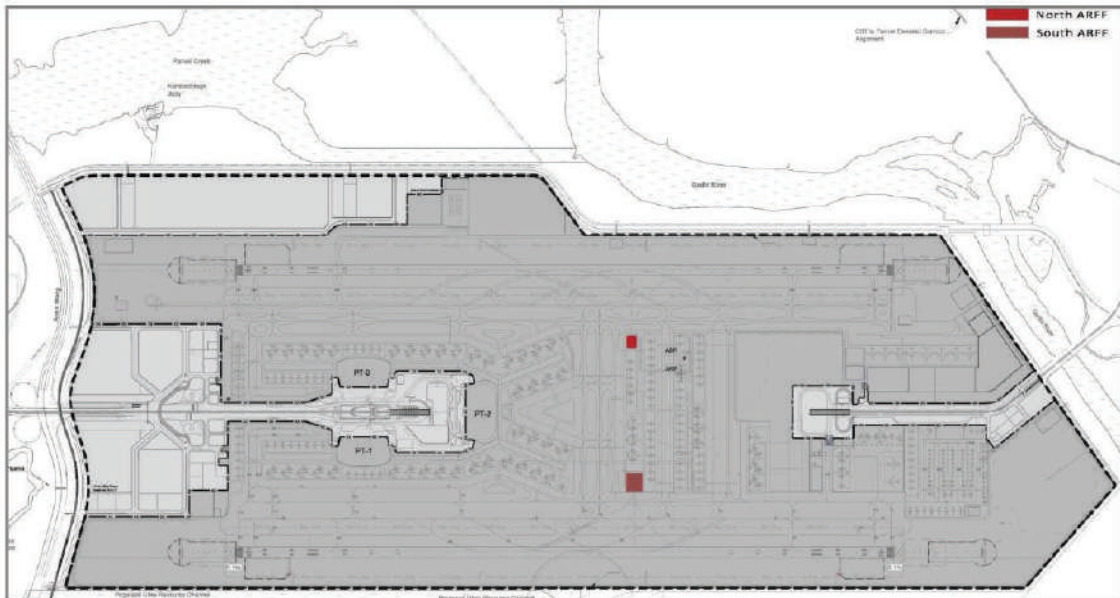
Air Rescue and Firefighting Facility 60 MAP
